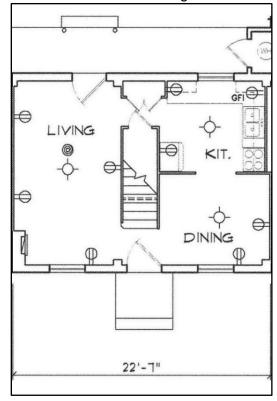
Type B, Two-Bedroom Floorplan – First Floor; Note: Extant window to left of living room door not drawn
